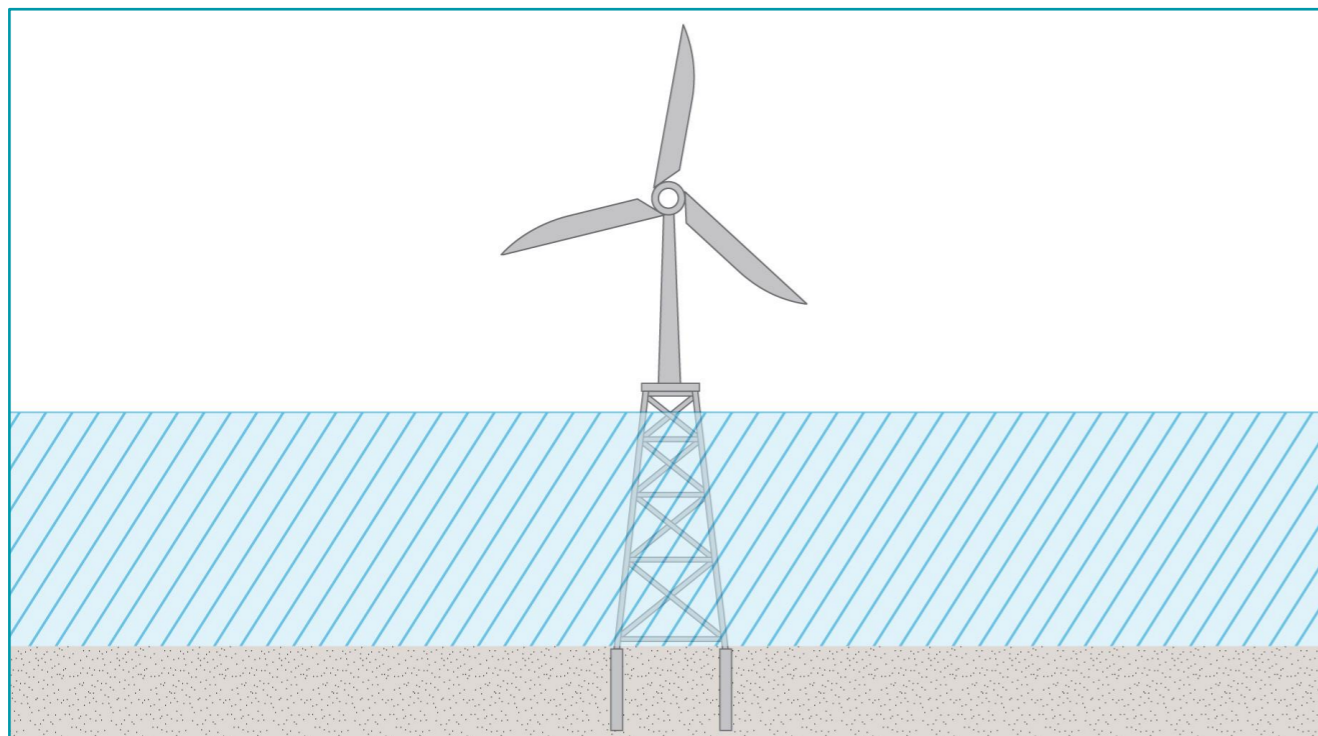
Indicative Schematic of a Jacket Foundation with Pin Piles
